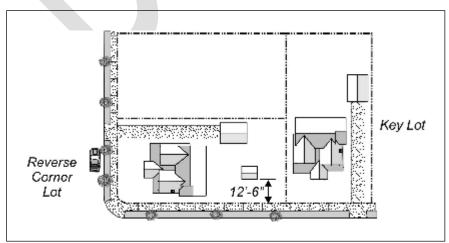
Accessory Structure on Reverse Corner Lot
